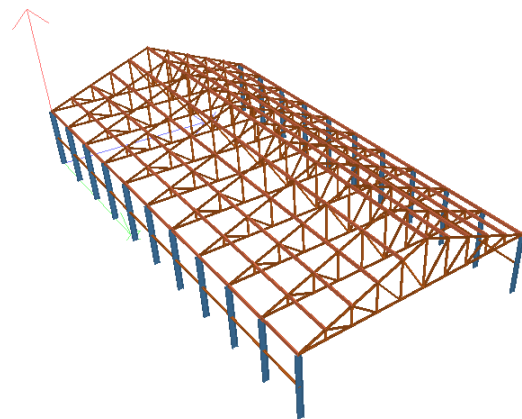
Staad-Pro Generated 3D View of Conventional steel building
